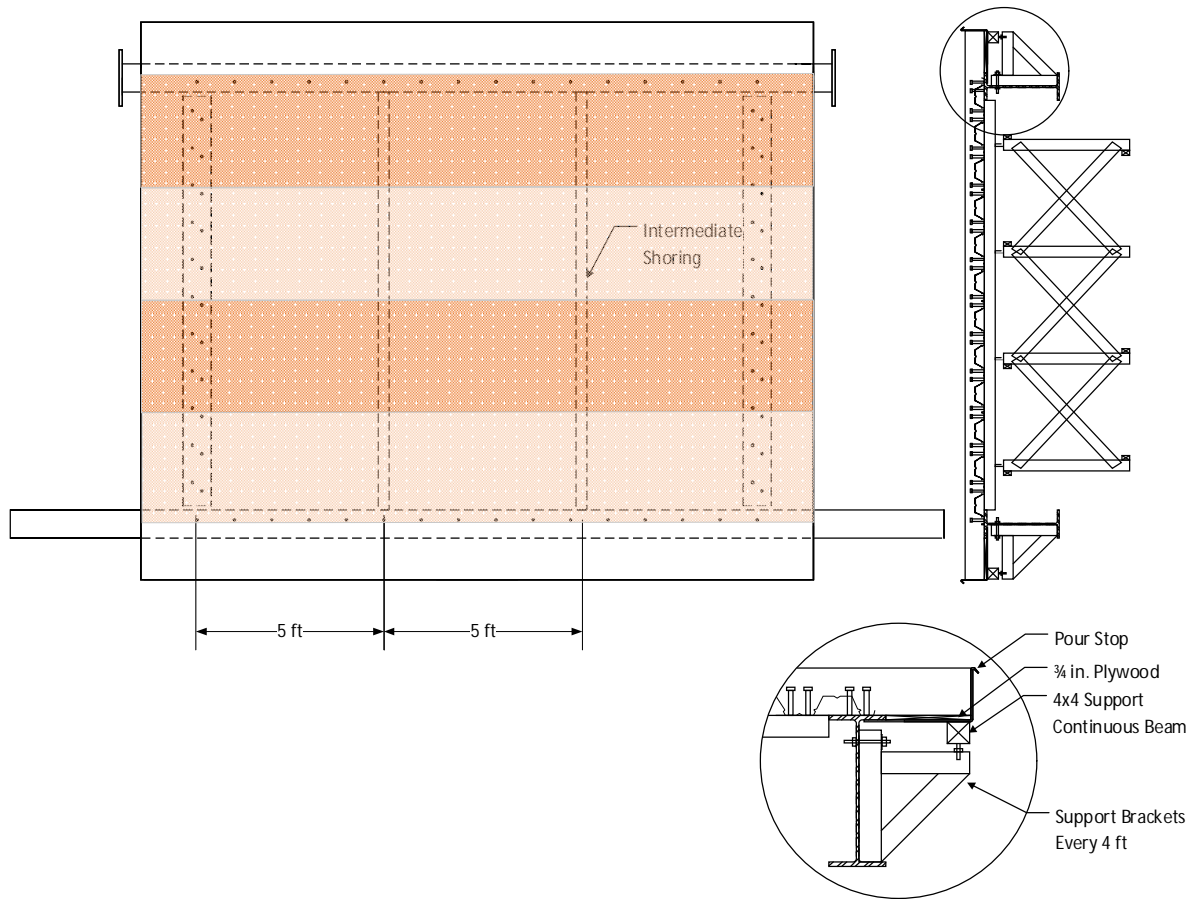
Shoring for Specimen 3/6.25-4-L-RS-DT
